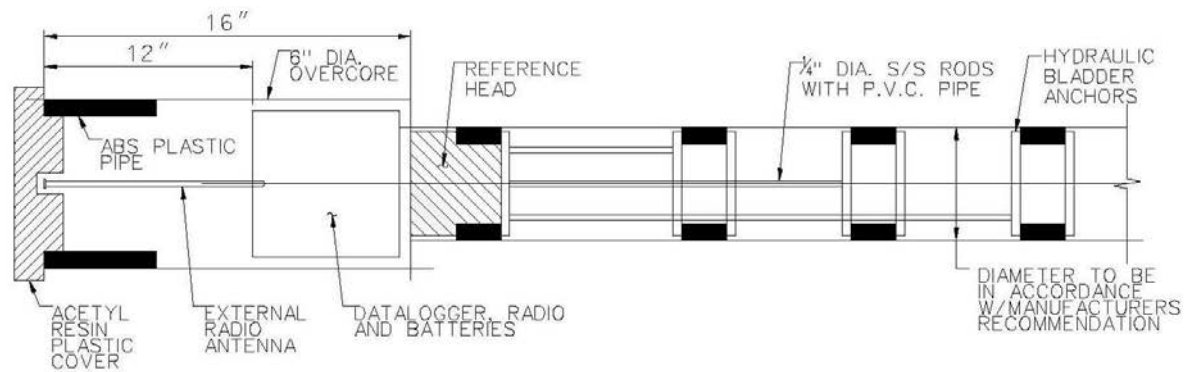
Horizontal Borehole Extensometer Installed from Advancing Excavation
